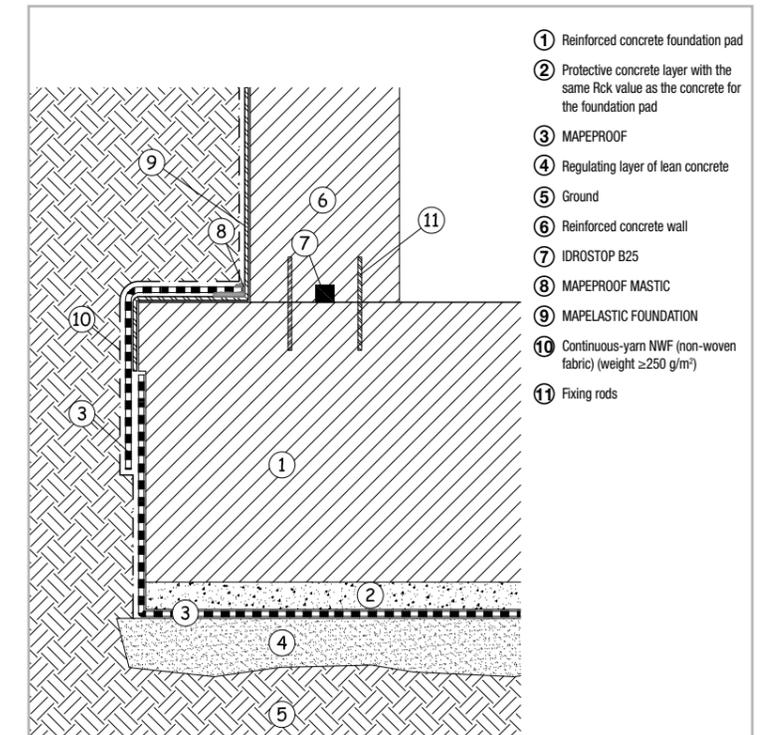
Detailed layout of waterproofing a foundation pad with MAPEPROOF and MAPELASTIC FOUNDATION applied on the wall
